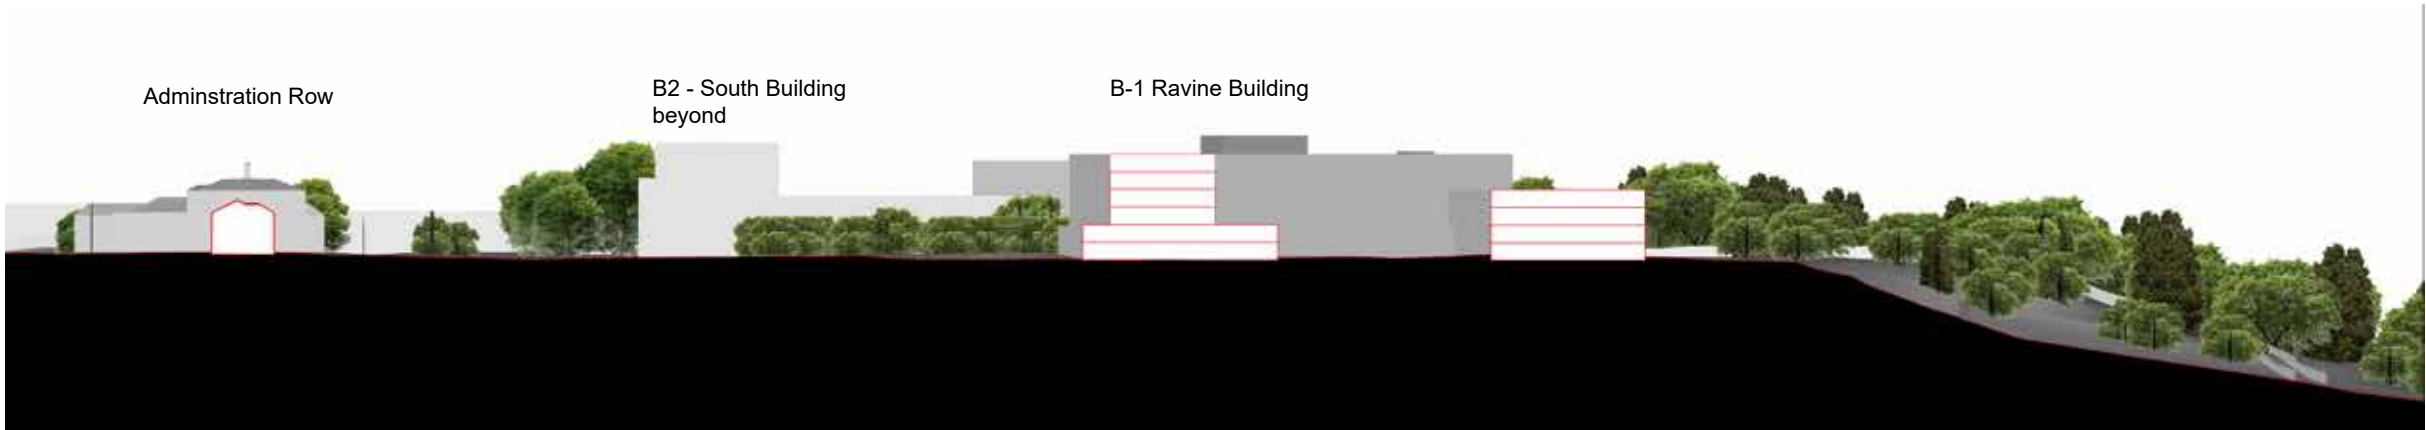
East-West section facing south through Admin Buildings and Plateau North Building site. Section Key above.
